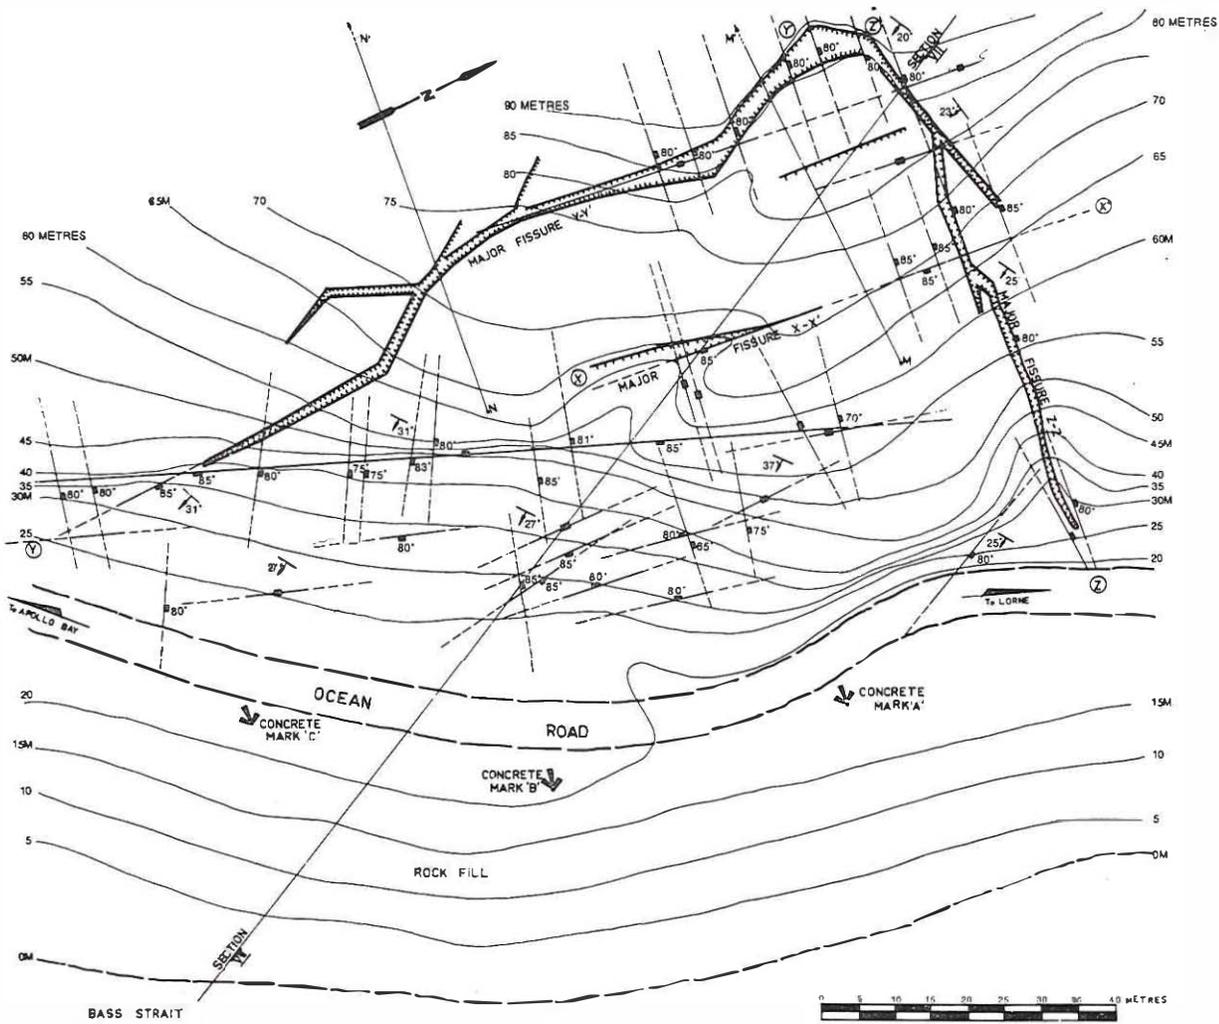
Plan of Windy Point landslide area, showing the major fissures, north-south and east-west vertical joints, and the location of Section VII (see Figure 8)
